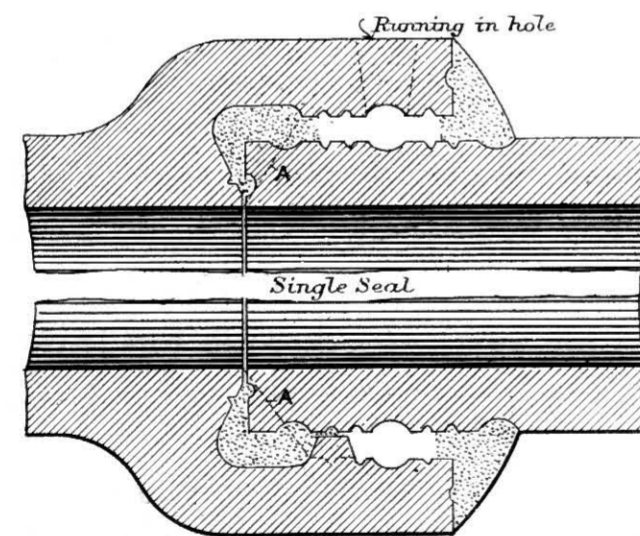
Ames and Crosta's Single-seal Drain-pipe Joint.
